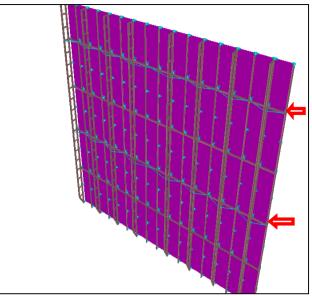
3D back view indicating alternate 1 and 3 cables position
